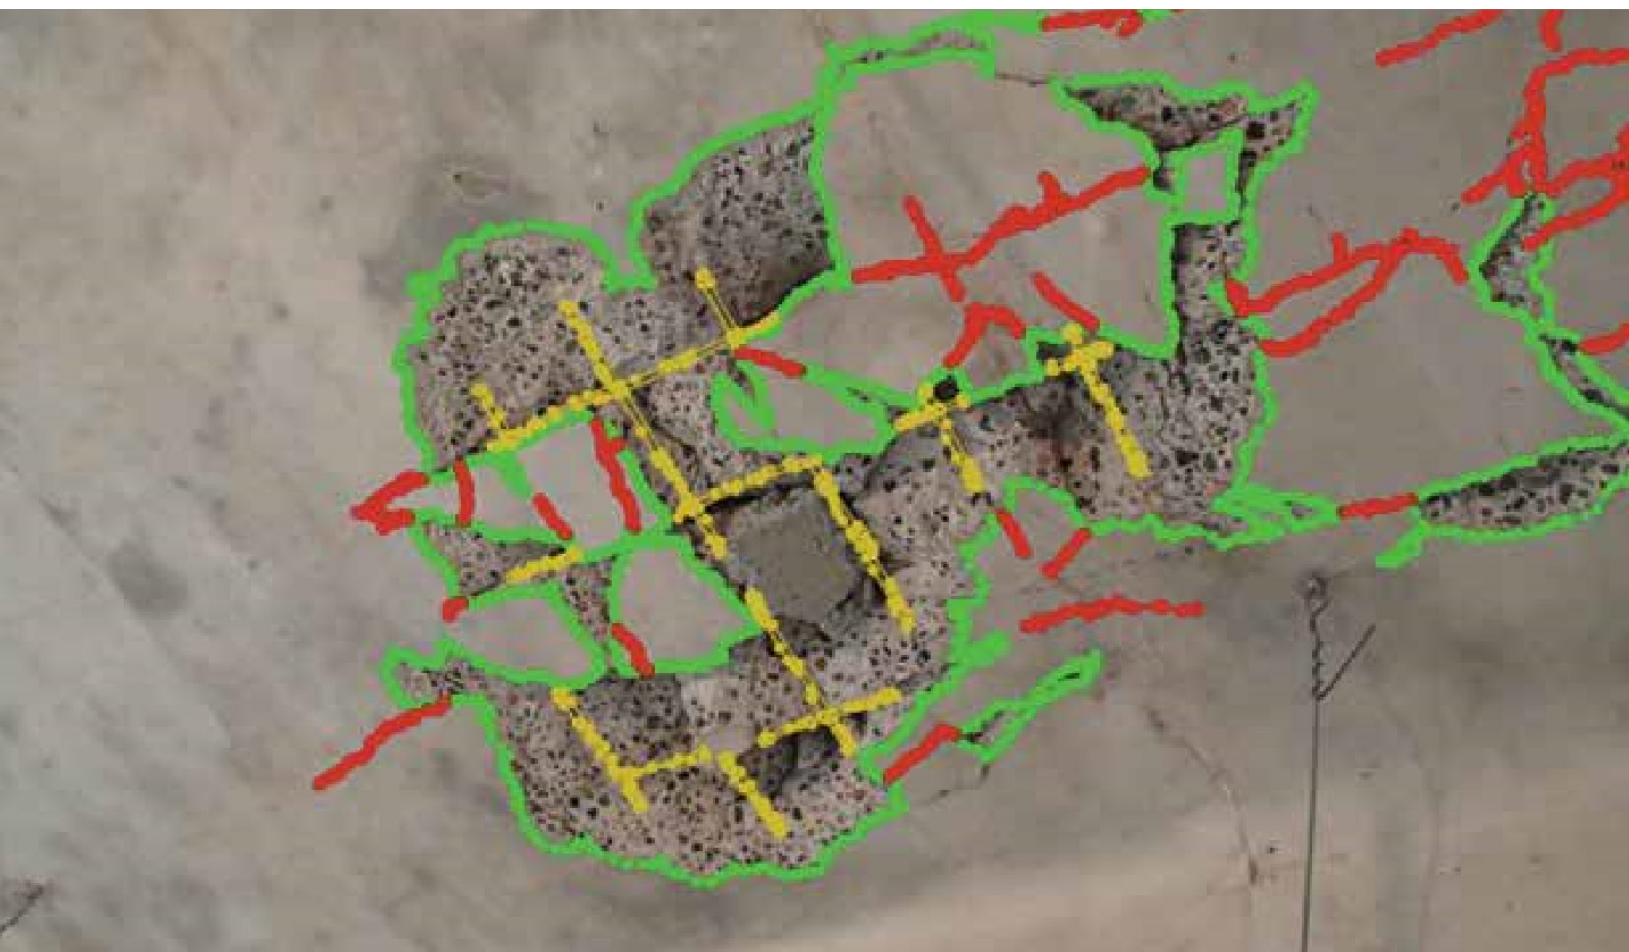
Automatic edge detection of spalling, cracking, and exposed reinforcement in concrete.
